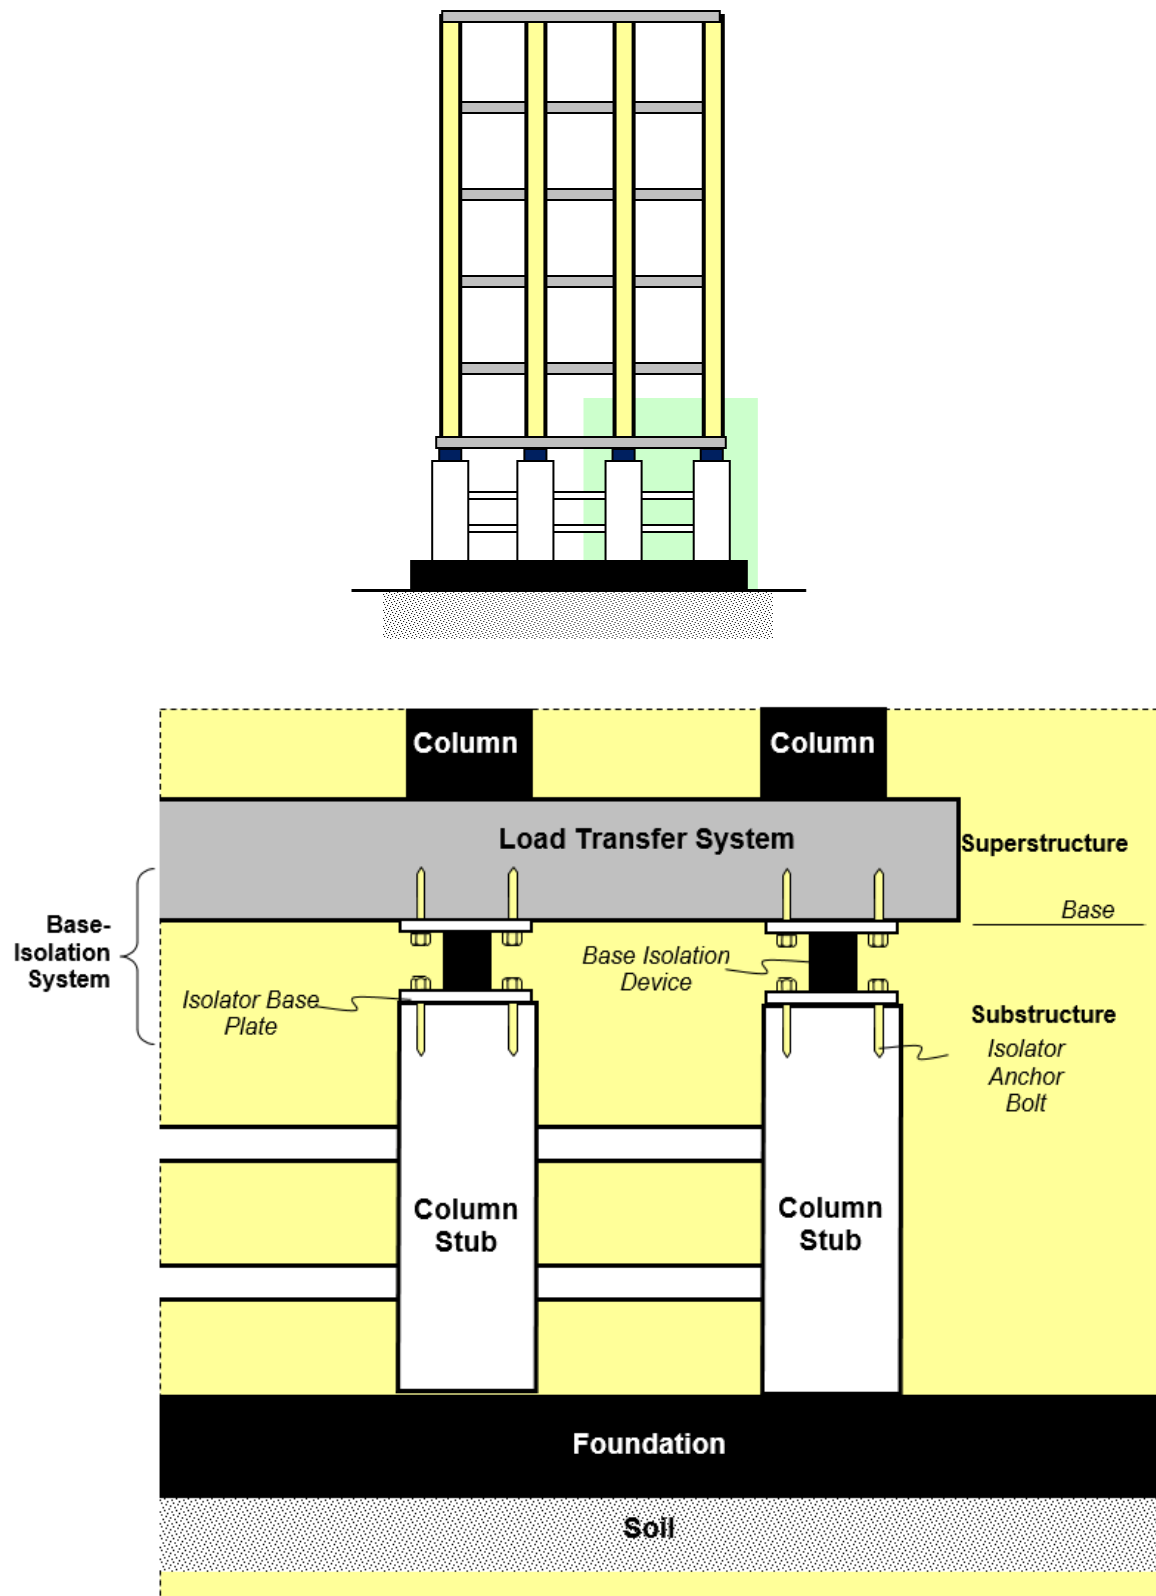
SECTIONAL ELEVATION OF A BASE ISOLATED BUILDING
